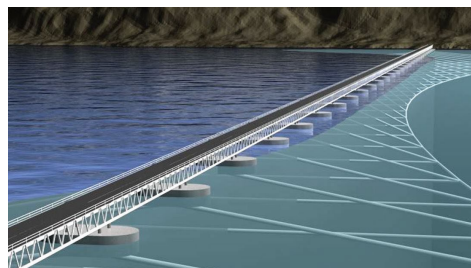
Artificial seabed: submerged tensioned cables for horizontal support.
